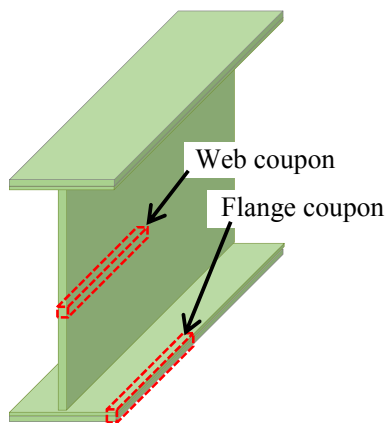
Cutting details of flange and web coupons from a GFRP/HFRP I-beam
